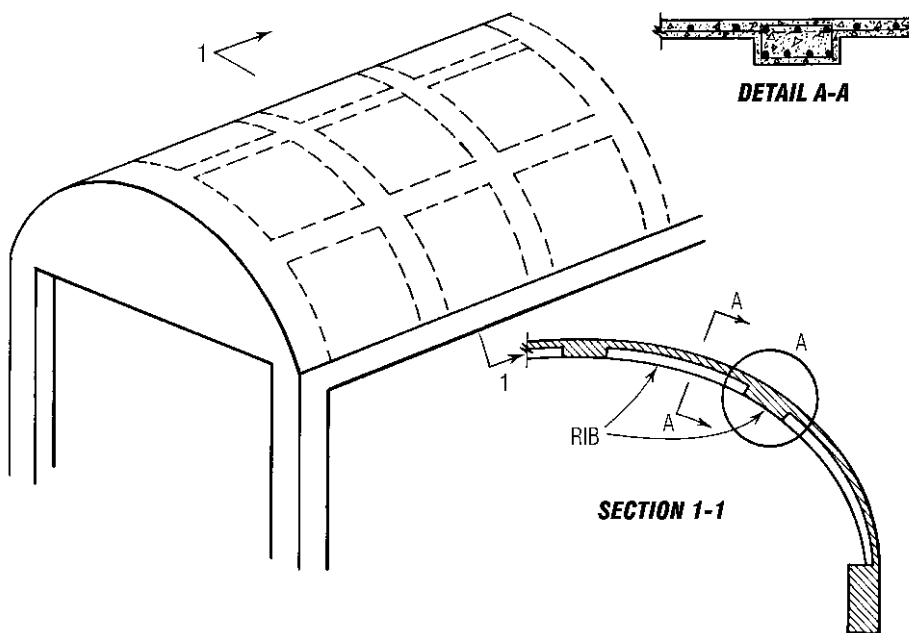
Arch with ribs in longitudinal and transverse directions.
